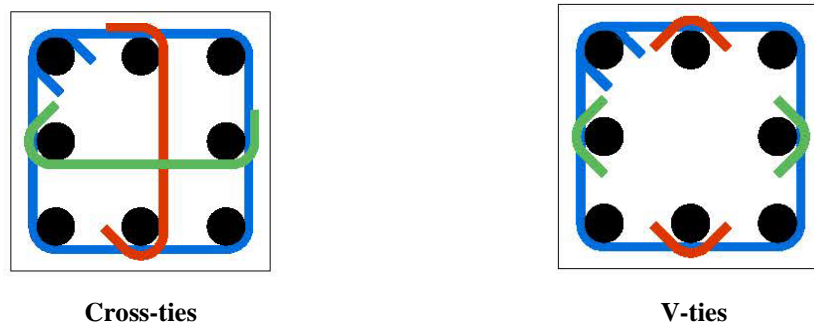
Details of transverse reinforcement for columns with cross-section (250 *250 mm).
